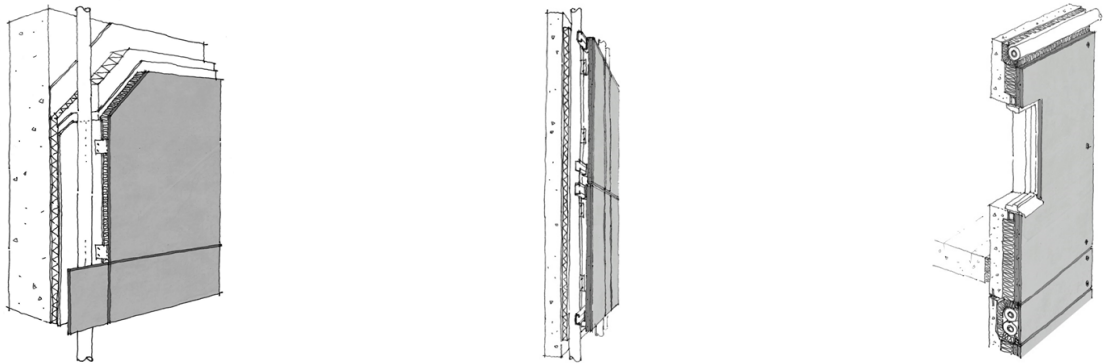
Different façade systems with fluid-carrying UHPC elements for renovation and new buildings: External thermal insulation composite system (ETICS) (left), rear-ventilated façade (center), sandwich wall (right) [75].
